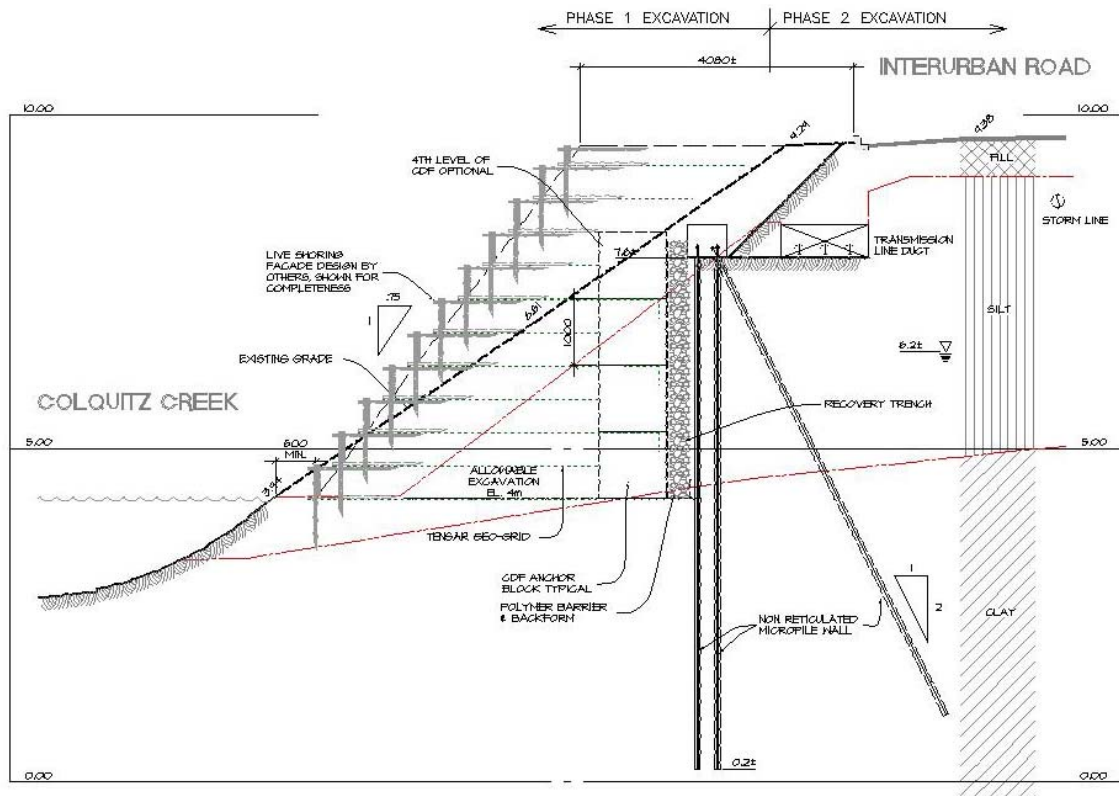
Section showing proposed works, Interurban Rd and utilities.
